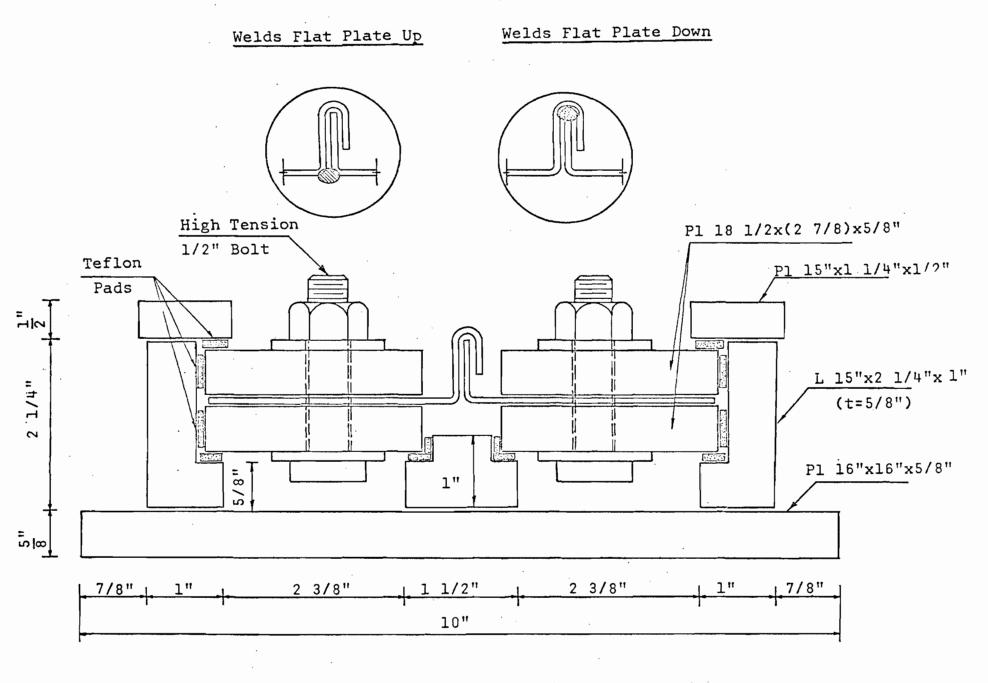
Section A-A for Welded Sidelap Connections
